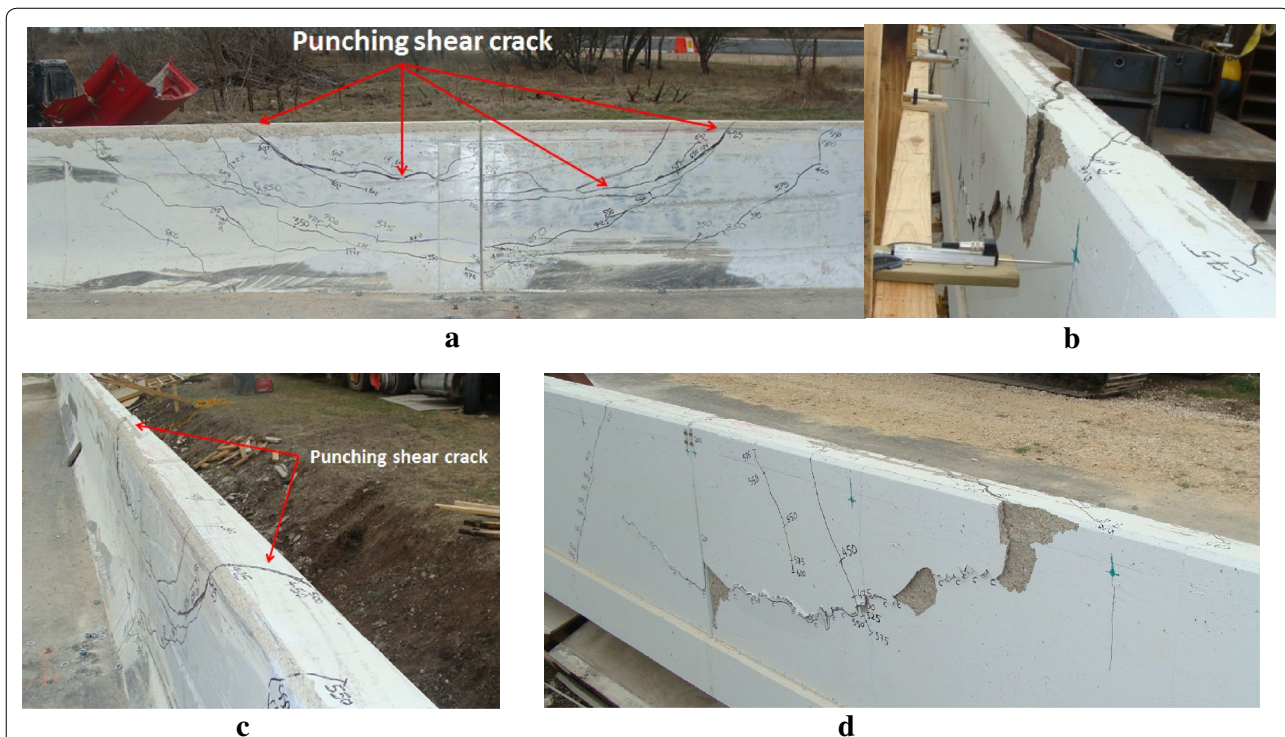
Views of crack pattern at interior barrier segment loaded at control joint. a Crack pattern at front face of the barrier, b punching shear through barrier thickness, c side view of punching shear failure, d back view of punching shear failure.
